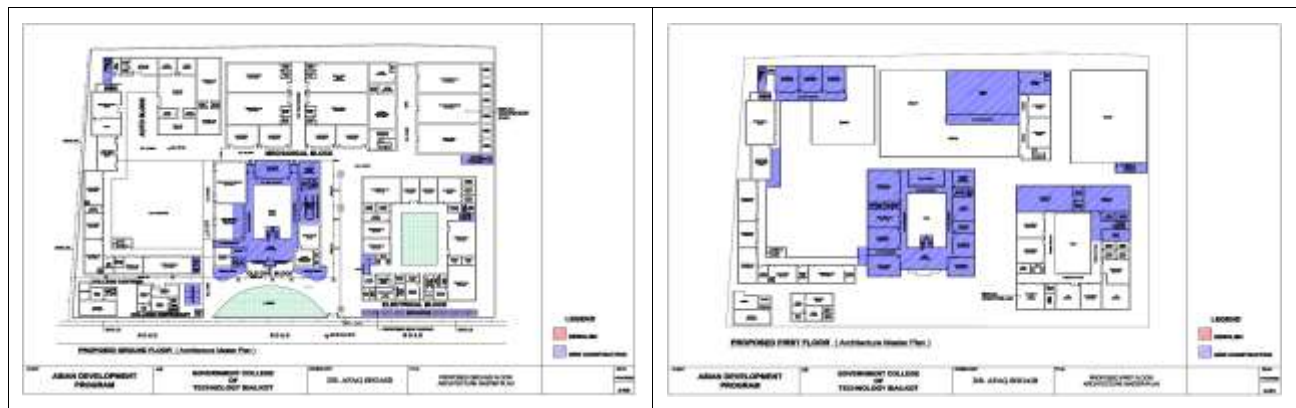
A: Designed Layout plan new facilities GCT Sialkot, Khanewal
